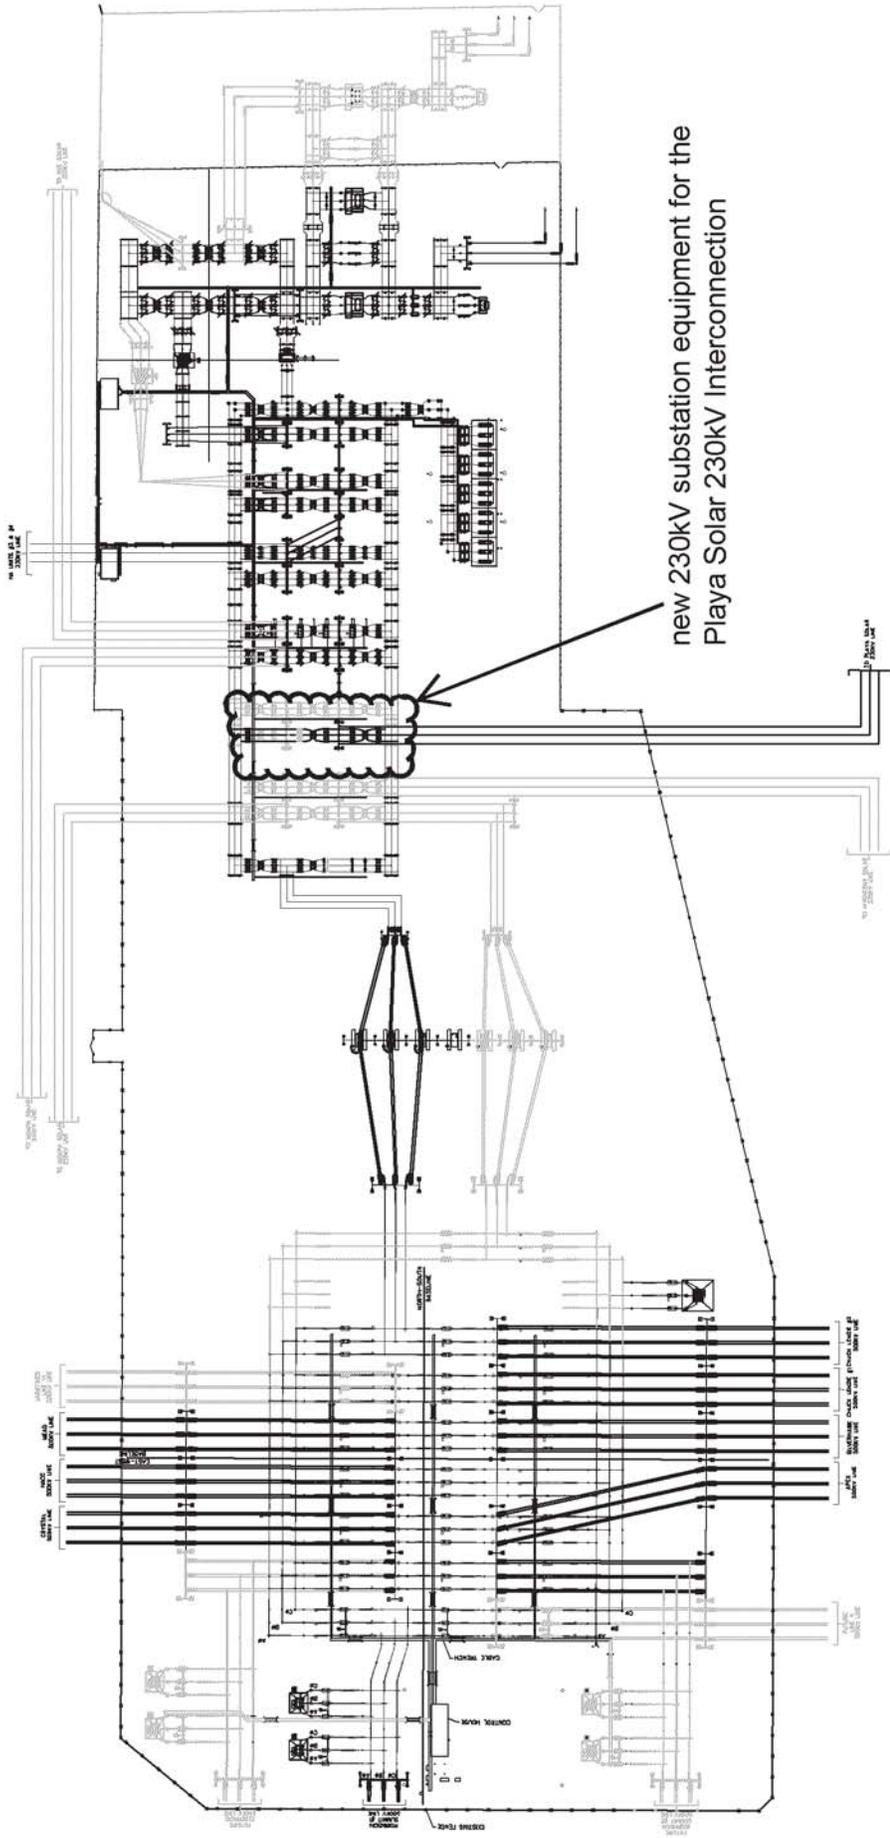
EXHIBIT B - PLAYA SOLAR INTERCONNECTION LAYOUT AT HARRY ALLEN SUBSTATION
